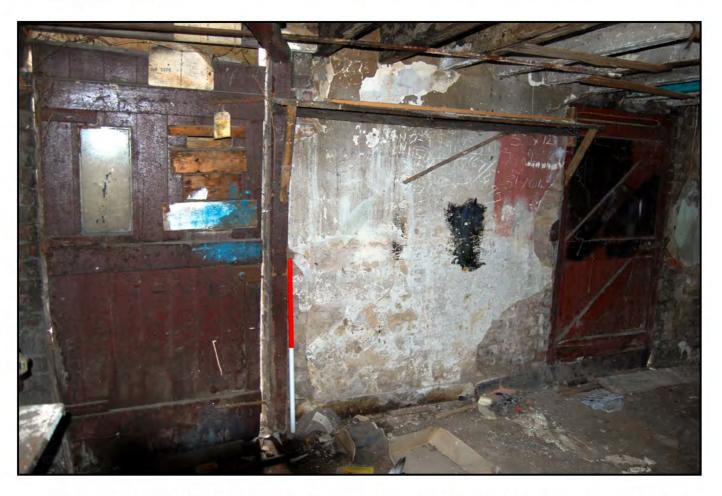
Yard 01 (PRN 30451)/Building 01 (PRN 30452): internal view detailing ground floor (south wall). one ledged and braced door and one ledged door surviving in the south wall. (Ranging pole: 1.0m)
